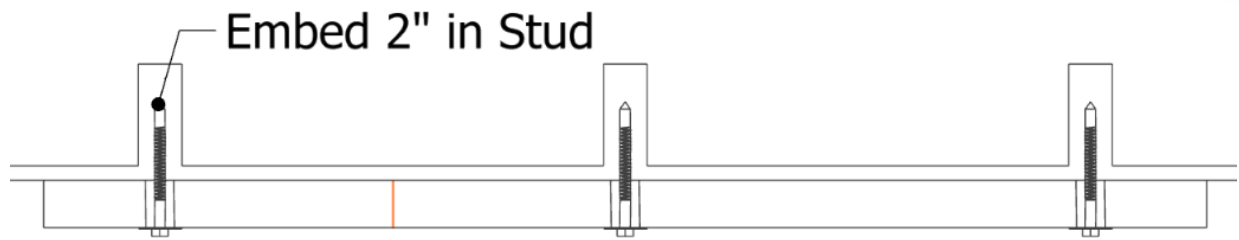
Embed the 3/8" lag Bolts into the Wall Studs to 2"
